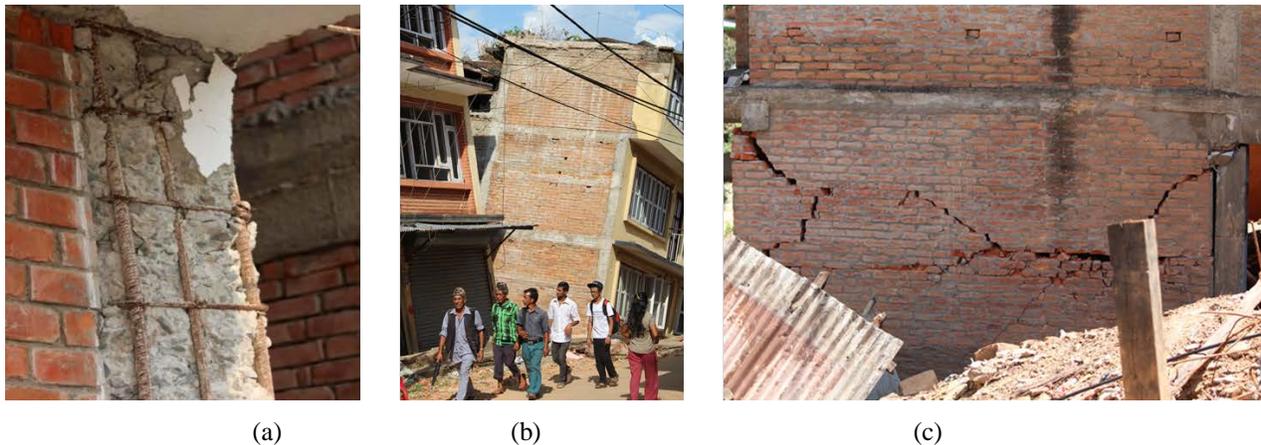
Damage in reinforced concrete buildings with brick infill walls: (a) poor detailing of rebars in concrete column, (b) soft-storey collapse of buildings due to open first floor , (c) damage to infill walls and concrete column due to shear
